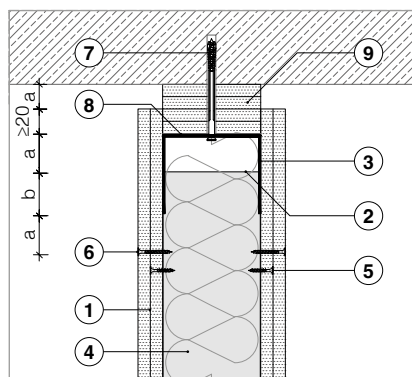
Connecting a partition wall ( $h > 6.5$  m) – variant 1 (with plasterboard spacers)
